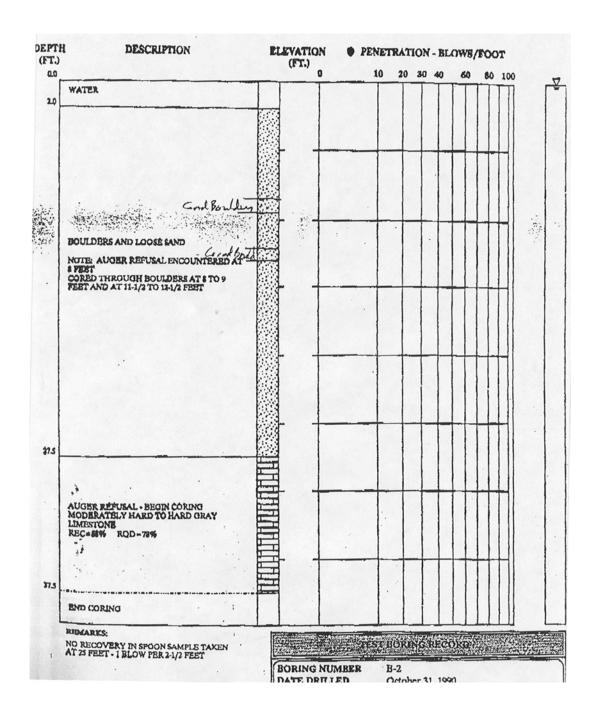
Boring taken from the site near the scoured Bridge Pier, from construction documents
